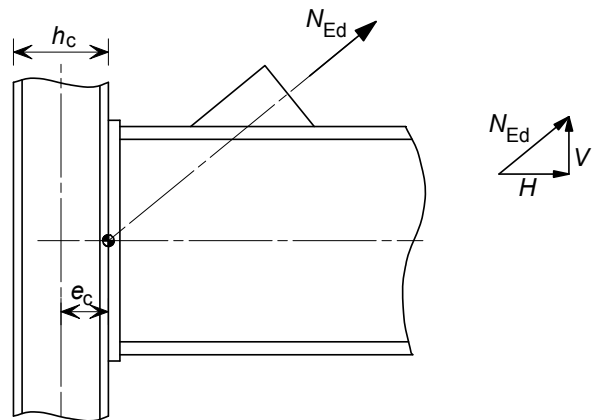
Force distribution for alternative setting out point on beam centre line
